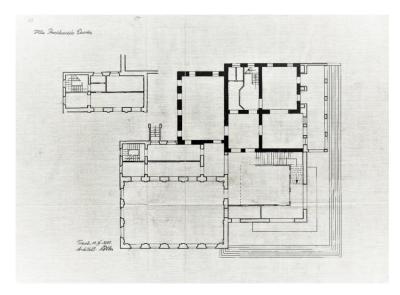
Ground floor plan by Hans Kohler (Source: AQTN).
